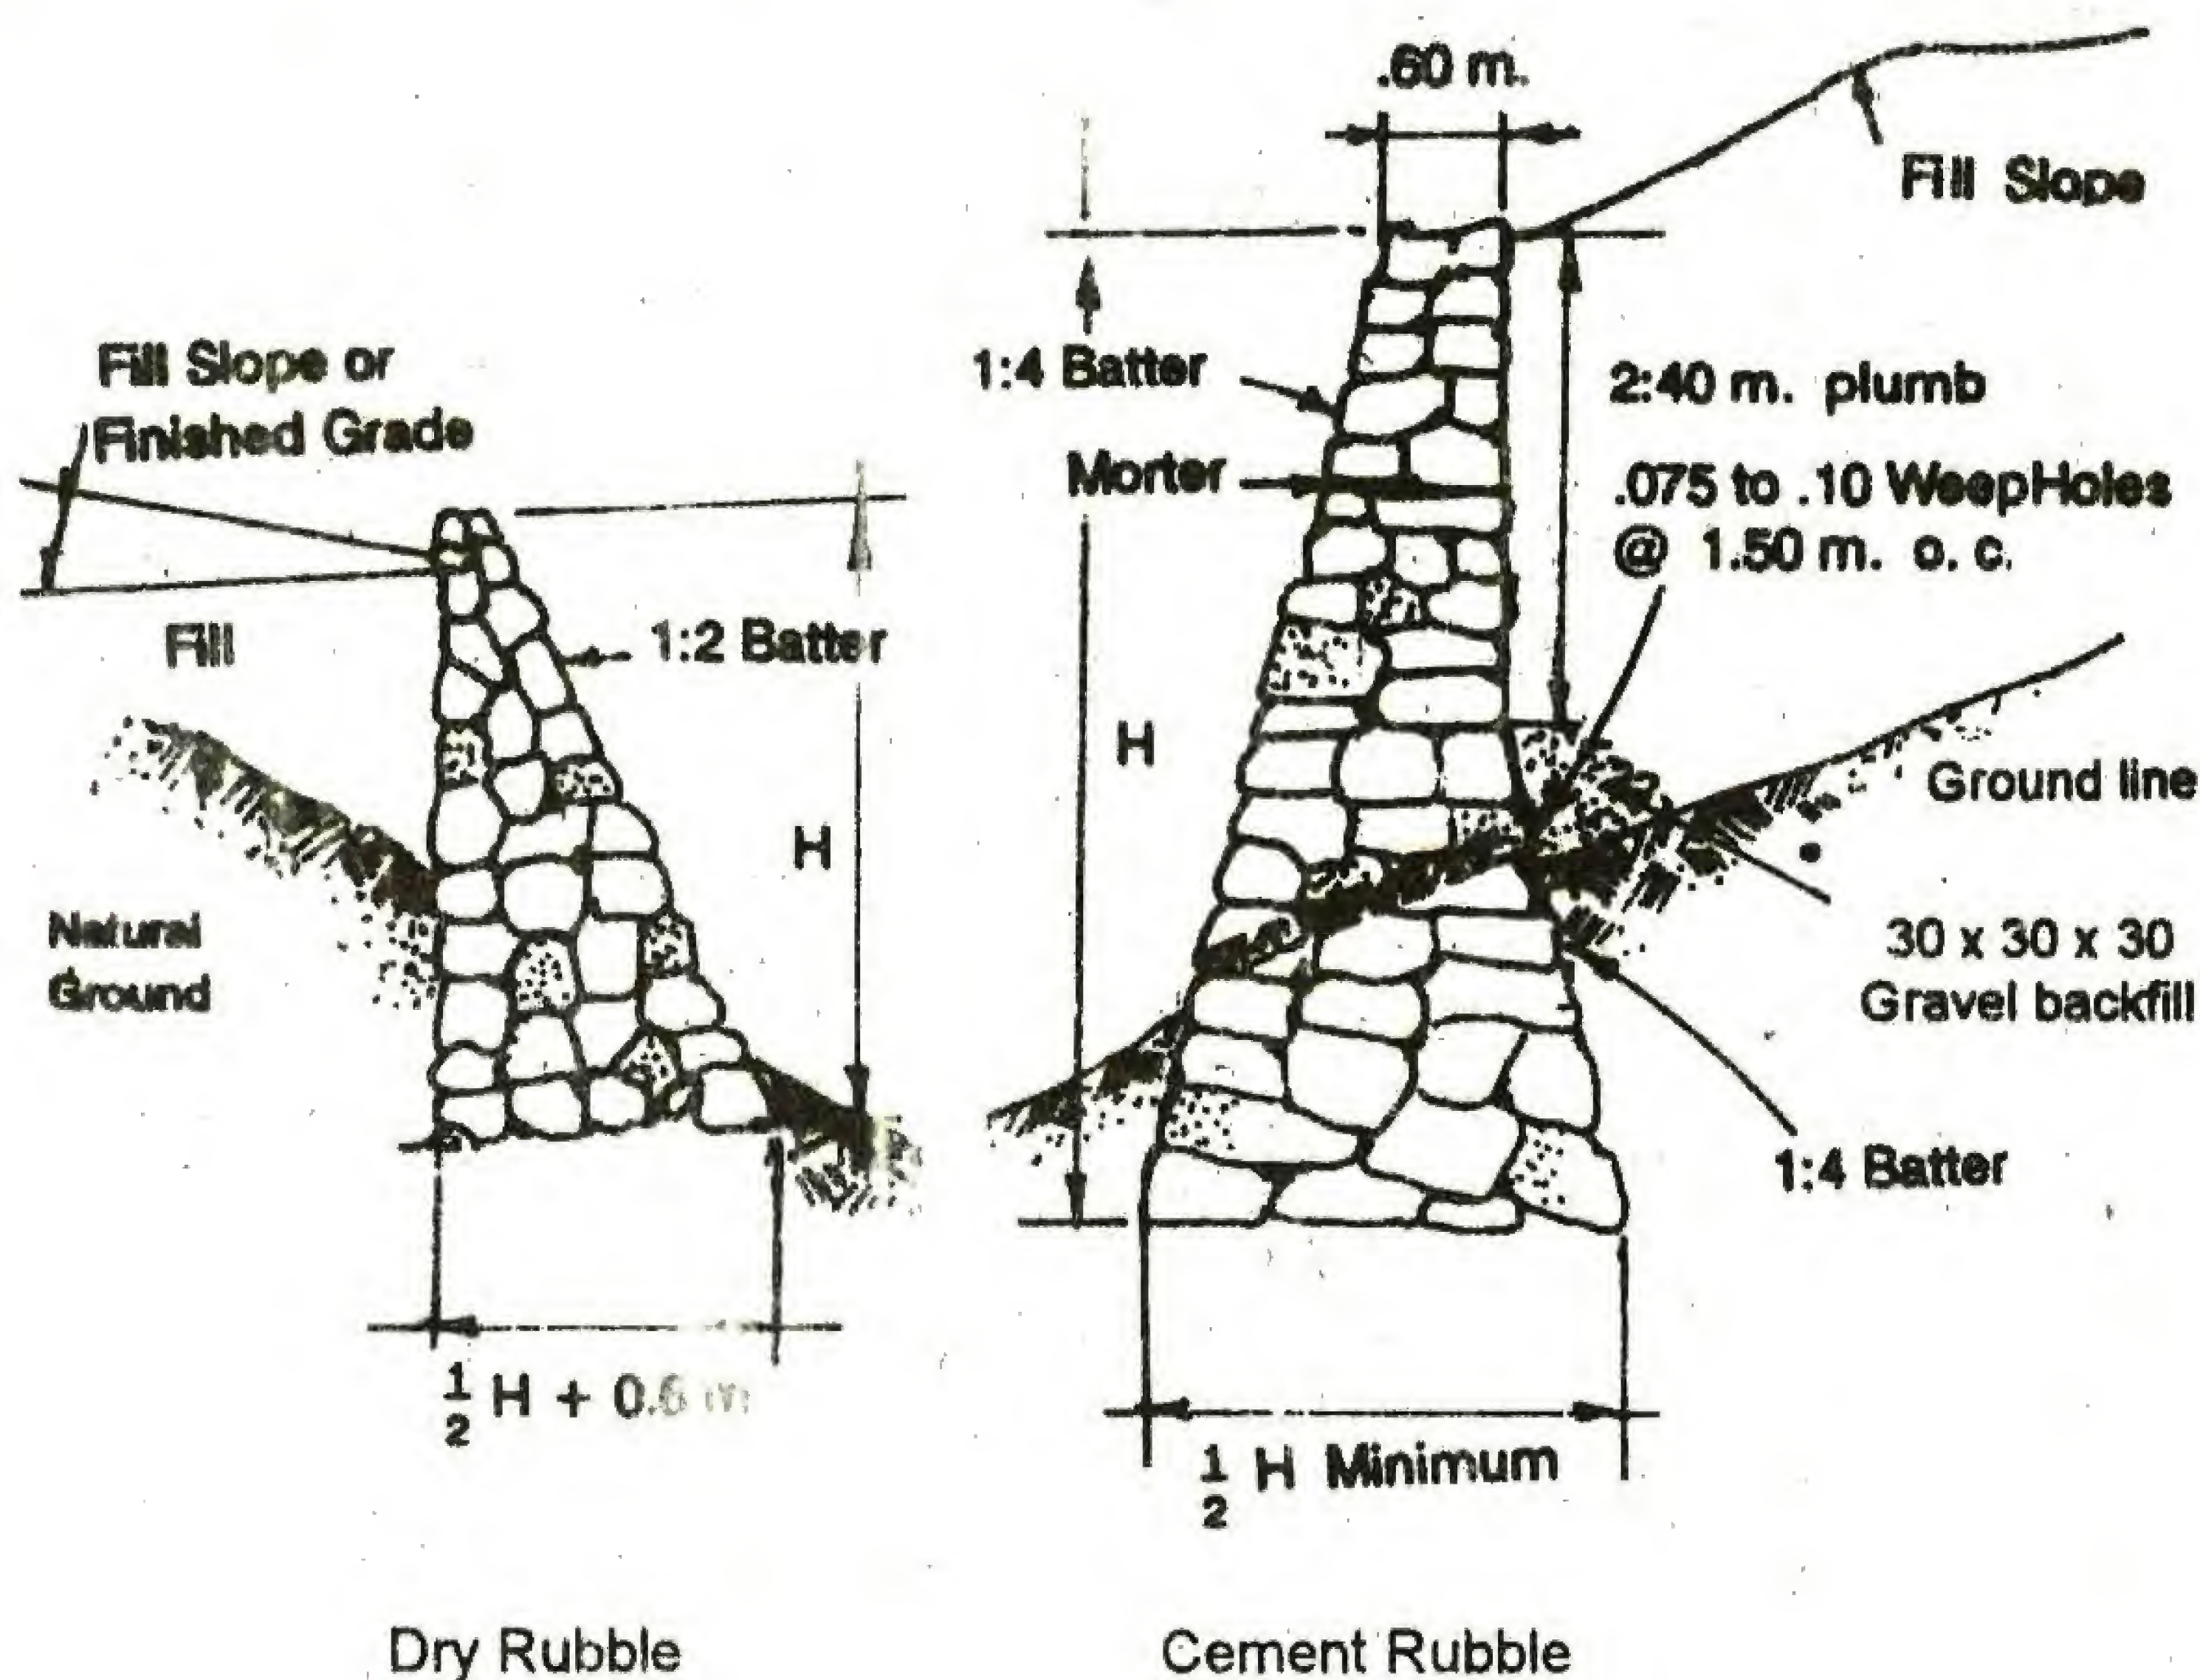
CROSS SECTION OF RUBBLE RETAINING WALL
